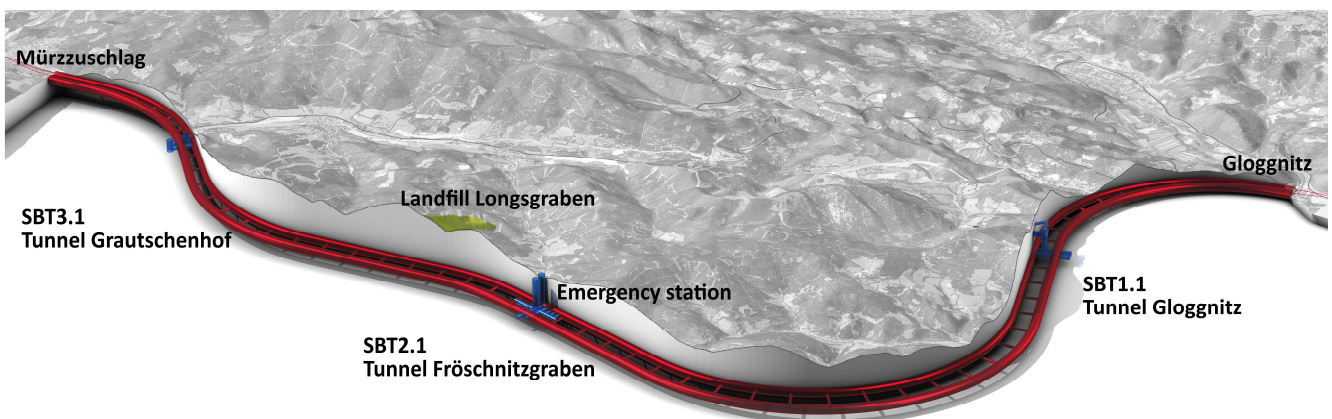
Scheme of tunnel system and construction lots (source: OEBB)
